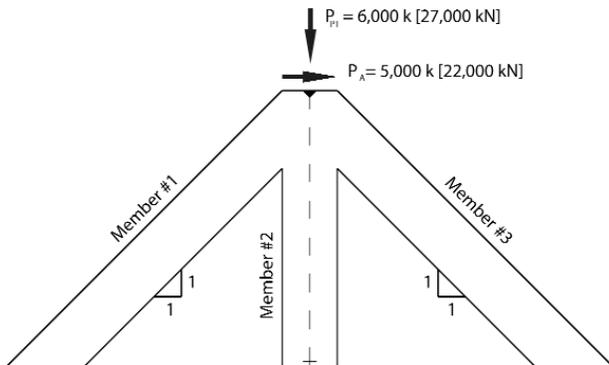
Alternate Modeling of Post-tensioned Truss
